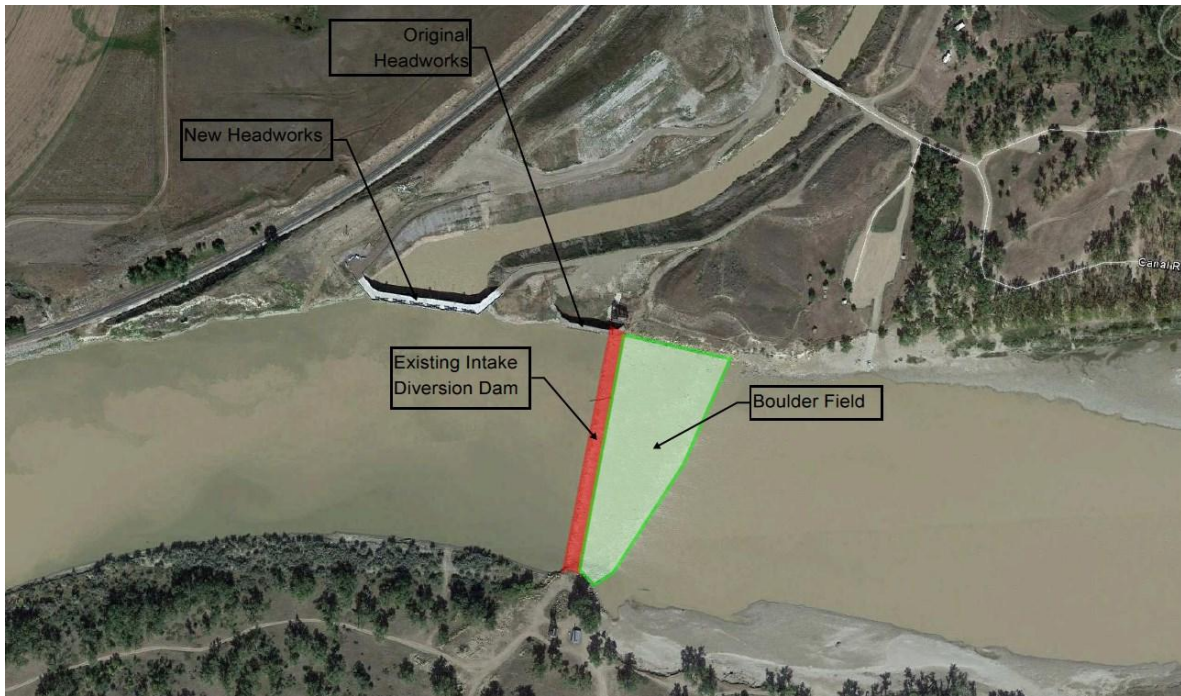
Existing Intake Diversion Dam Removal Layout
